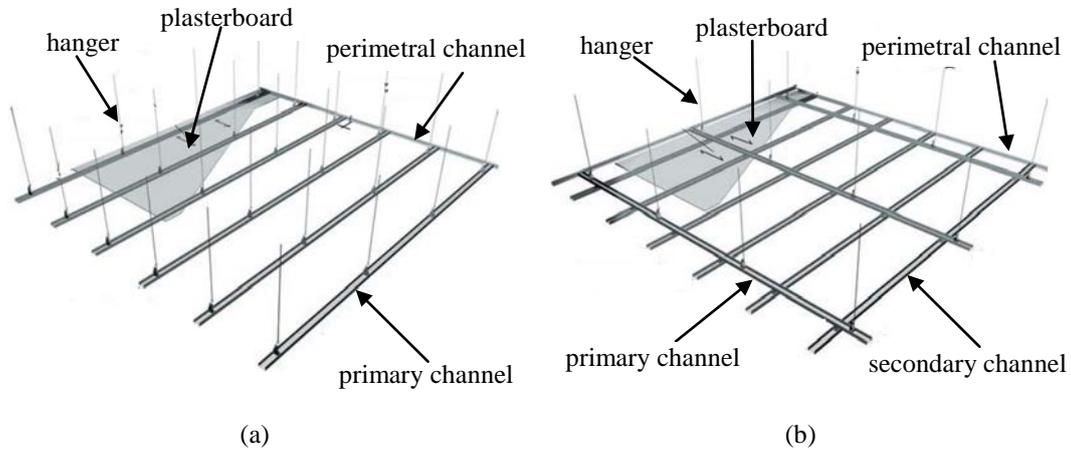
Suspended plasterboard continuous ceilings: (a) single frame ceiling (SFC); (b) double frame ceiling (DFC)
